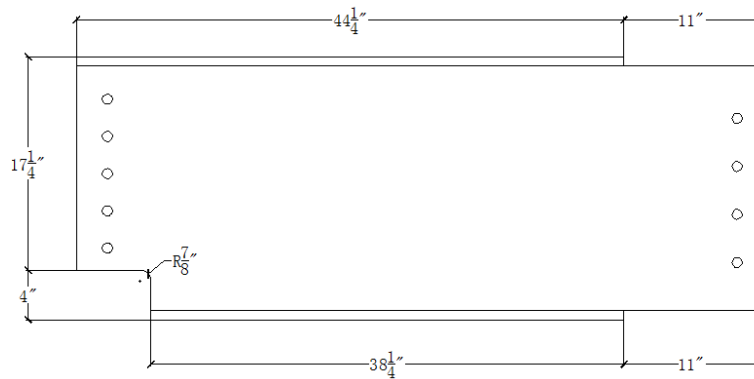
Stringer dimensions for the specimen utilizing a double-angle connection
